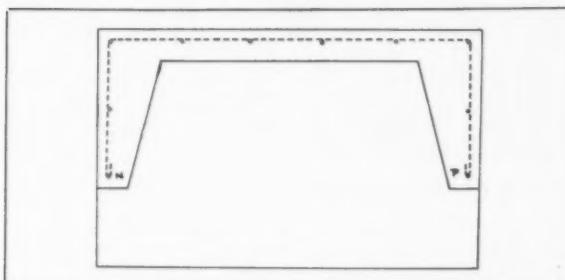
Horizontal Ties in Reinforced Concrete Chimney
